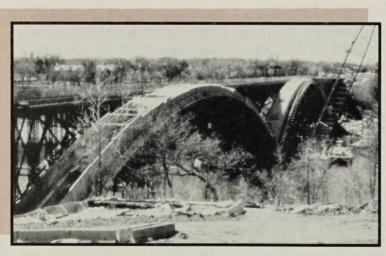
Lake Street-Marshall Avenue bridge near St. Paul Minnesota.
